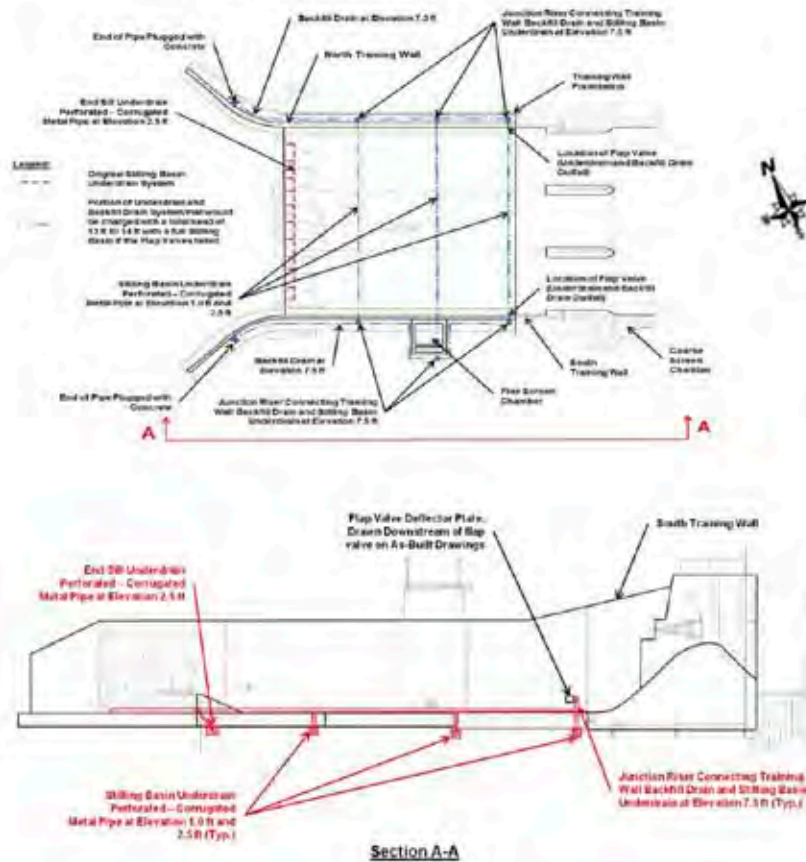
SERVICE SPILLWAY PLAN AND CROSS SECTION FOR BACKFILL/UNDERDRAIN SYSTEMS
